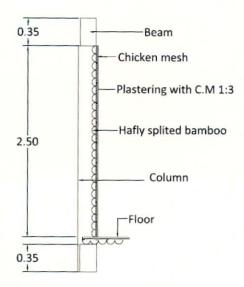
Wall details of the bamboo house (all dimensions in m).
